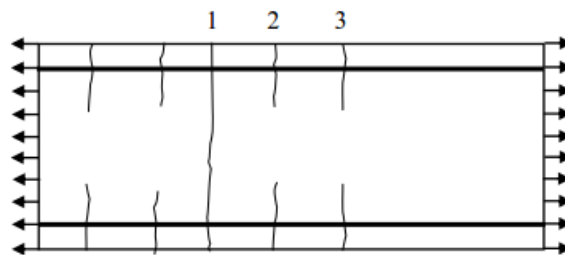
Cracking for thick reinforced concrete element (Engström, 2014, s. 105).
